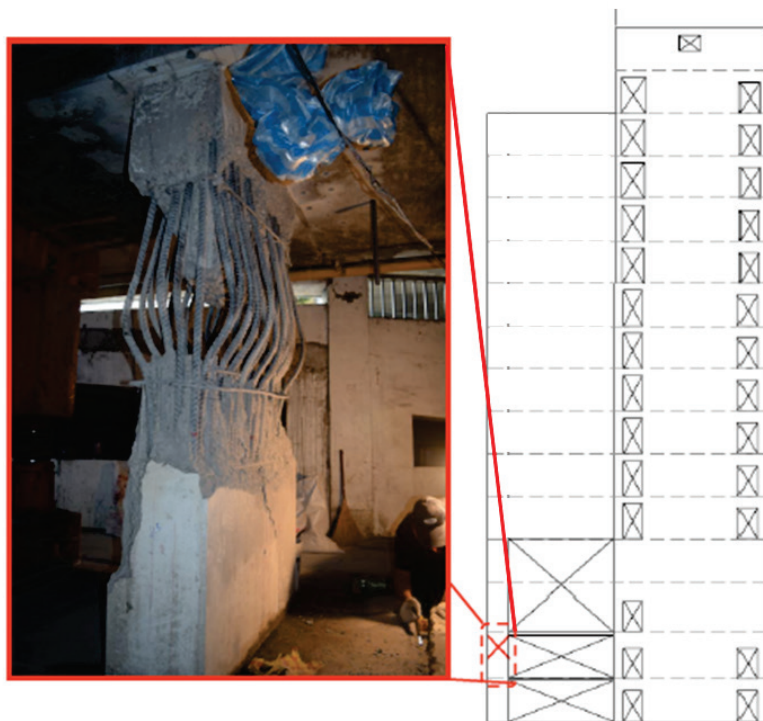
Damage to “column” at wall discontinuity in a 20-story high-rise building (2016 Meinong earthquake; image from Pujol et al., 2017).
